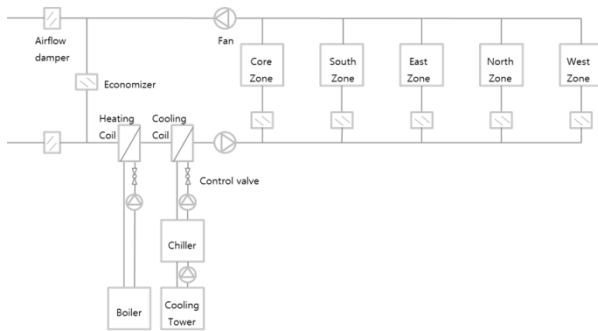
Typical Heating, Ventilation and Air-conditioning (HVAC) system in a building
